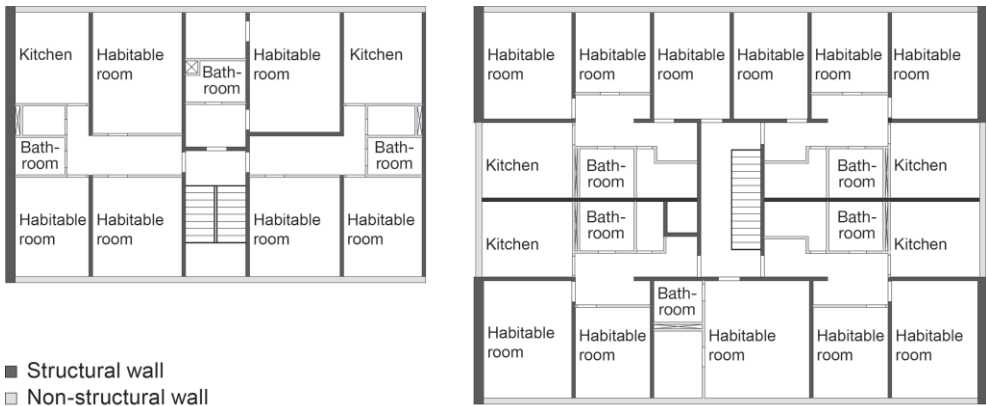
Typical locations of structural and non-structural walls in slab blocks (left) and tower blocks (right) in the studied building stock.
